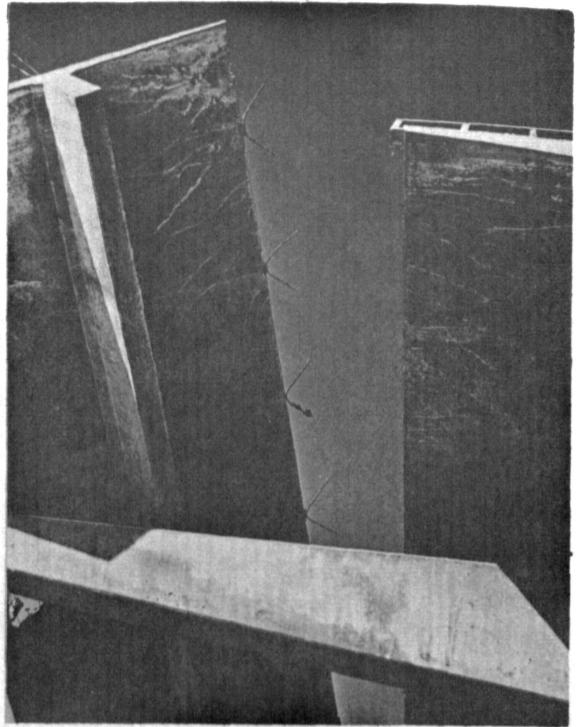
(upper left). Failure of precast concrete connections, Alaska Sales and Service.
